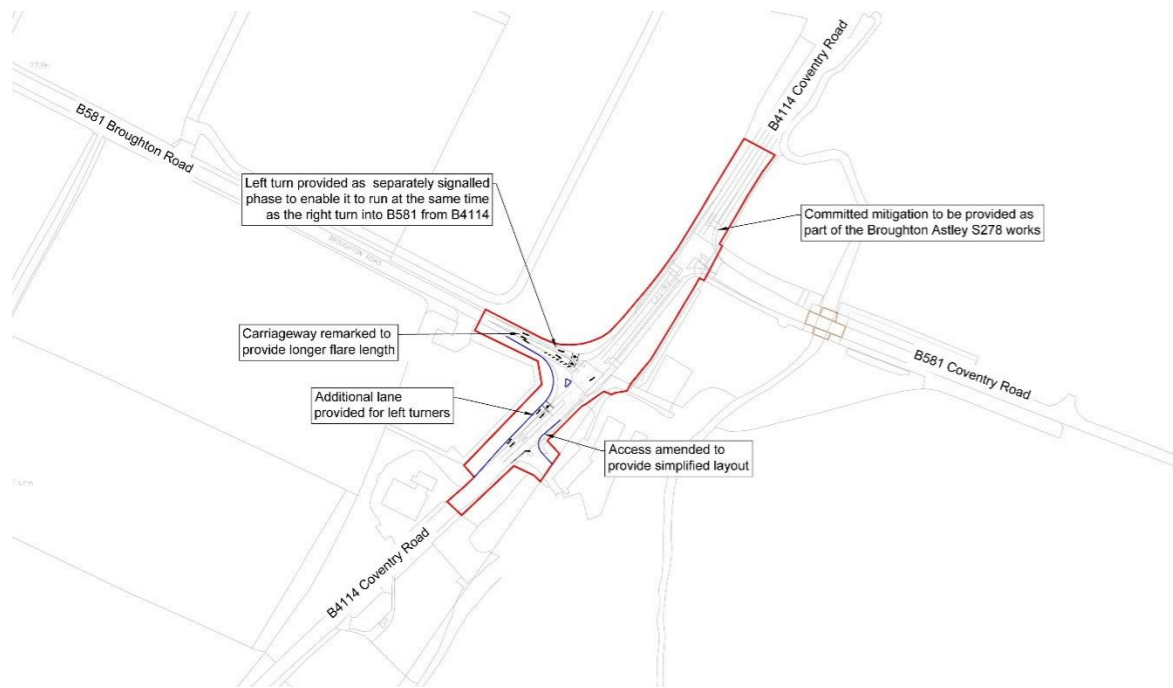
Proposed Works to Coventry Road / Broughton Road junction east of Stoney Stanton
